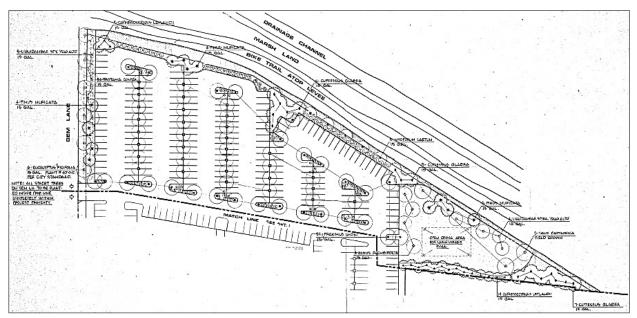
Sheet 2 of Planting Plan showing public access area along the levee.
